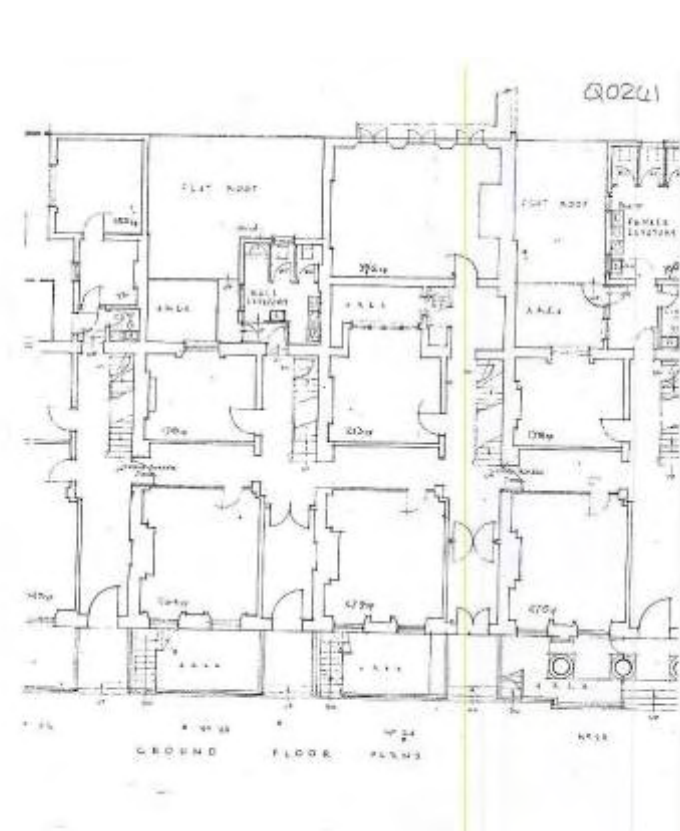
Extract of Ministry of Works plans, 1946 Ground Floor for Chester Terrace Nos. 25 – 23. Crown Estate Archive
